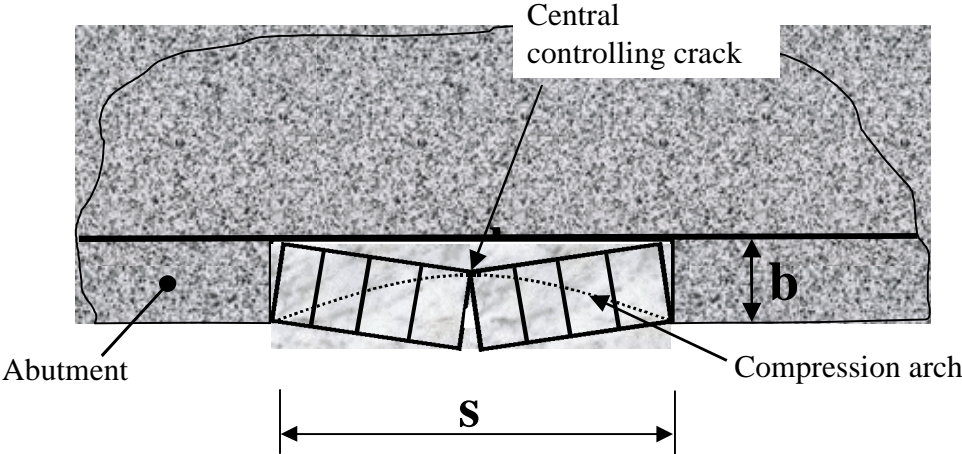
Voussoir beam geometry for hangingwall beam analysis.
